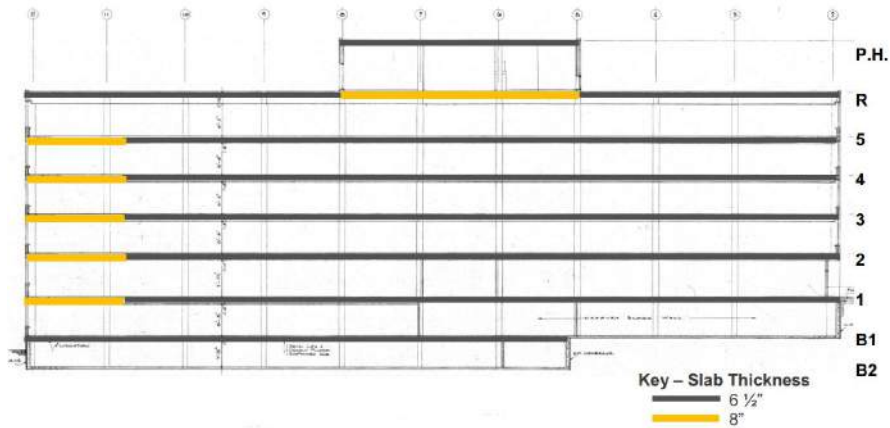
Section through existing building showing slab thicknesses, base section from Drawing A10
